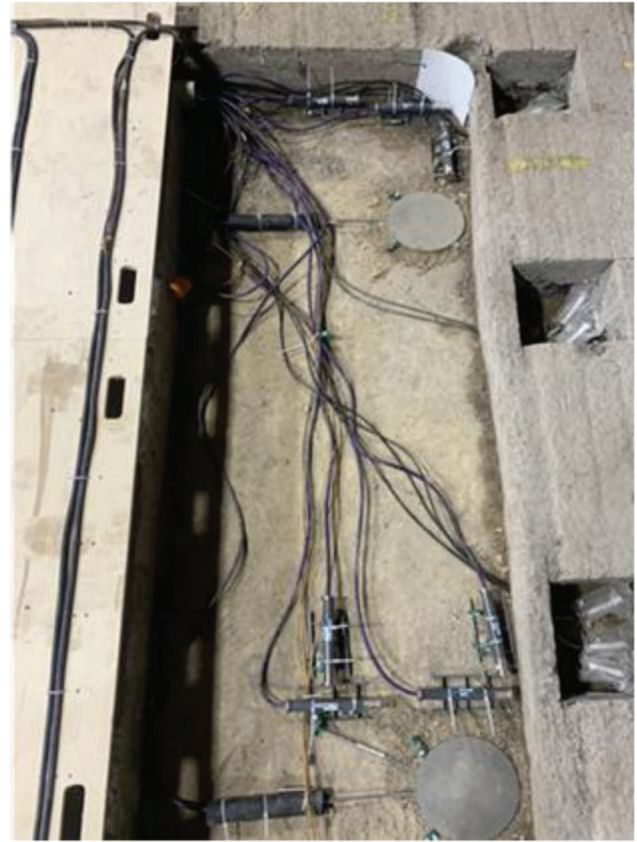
Flexible section after milling 2 in. from the surface and excavating the DWPT unit geometrical space.
